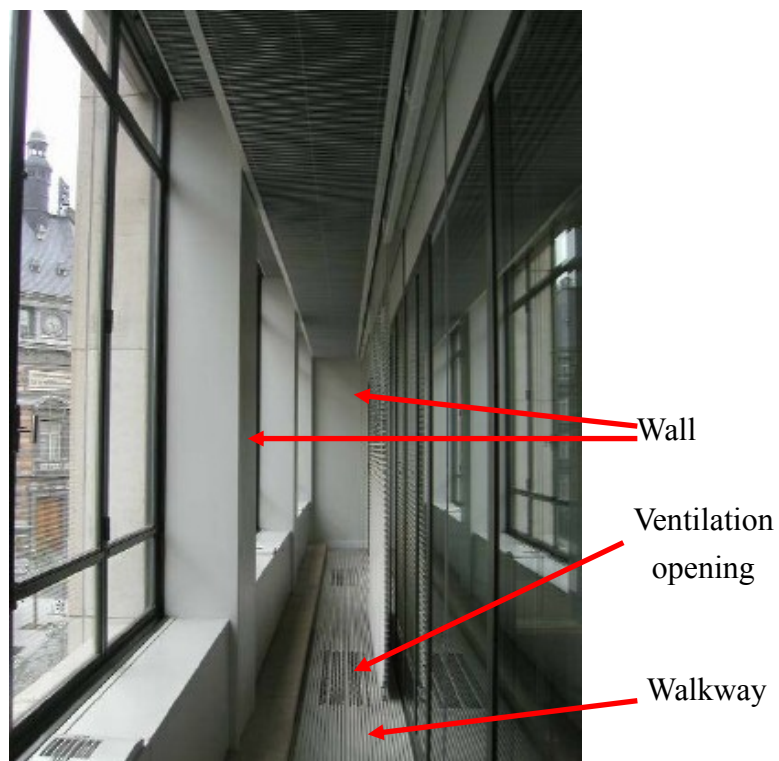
Cavity with permanent ventilation openings – membrane can be applied on walls or walkways
